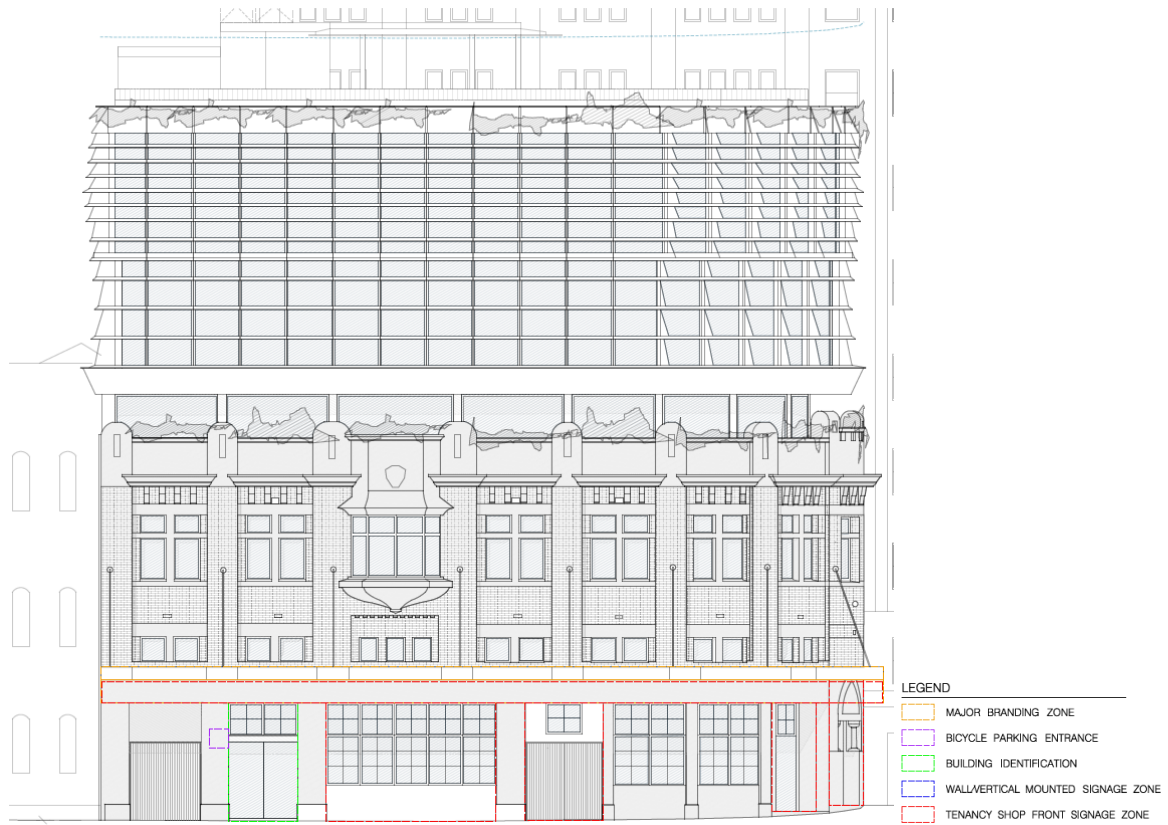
Proposed signage strategy, Flinders Street (east) elevation
